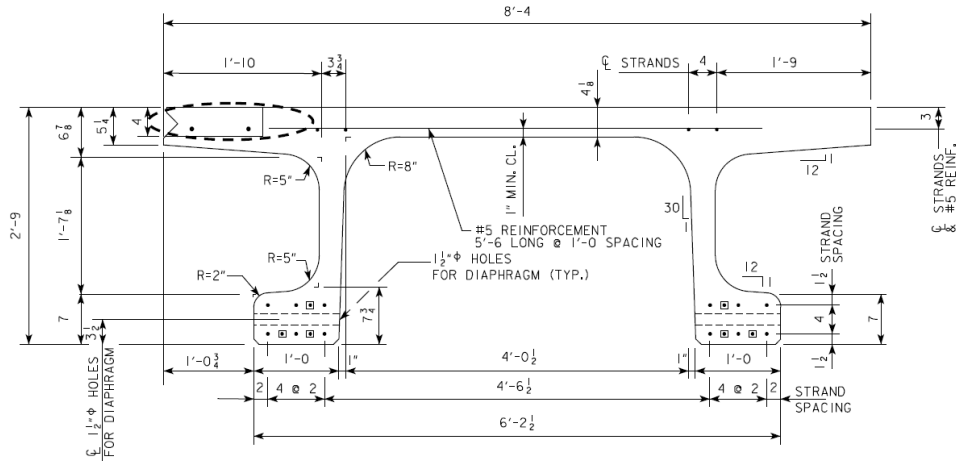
Cross Section of Pi-Girder (Rouse 2011)
